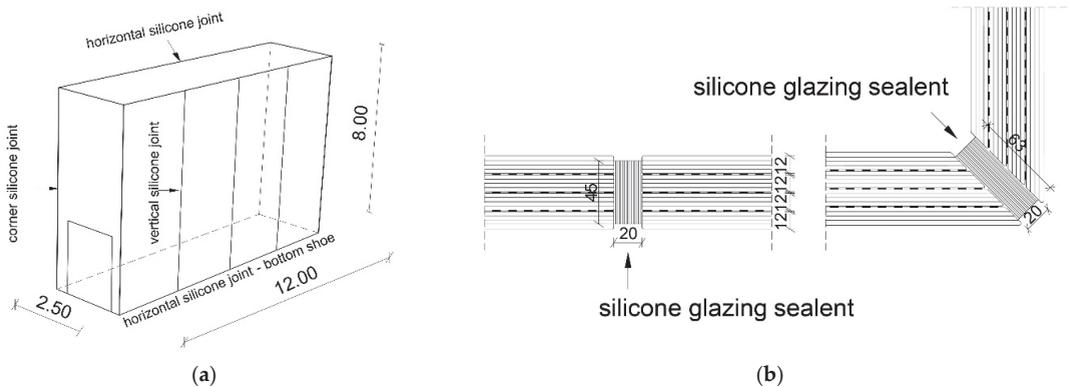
The Apple Retail Store in Milan: (a) axonometry with marked silicone joints; (b) detail of the connection of glass panes in the wall and the pavilion's corner (developed by the author based on the [113]).
